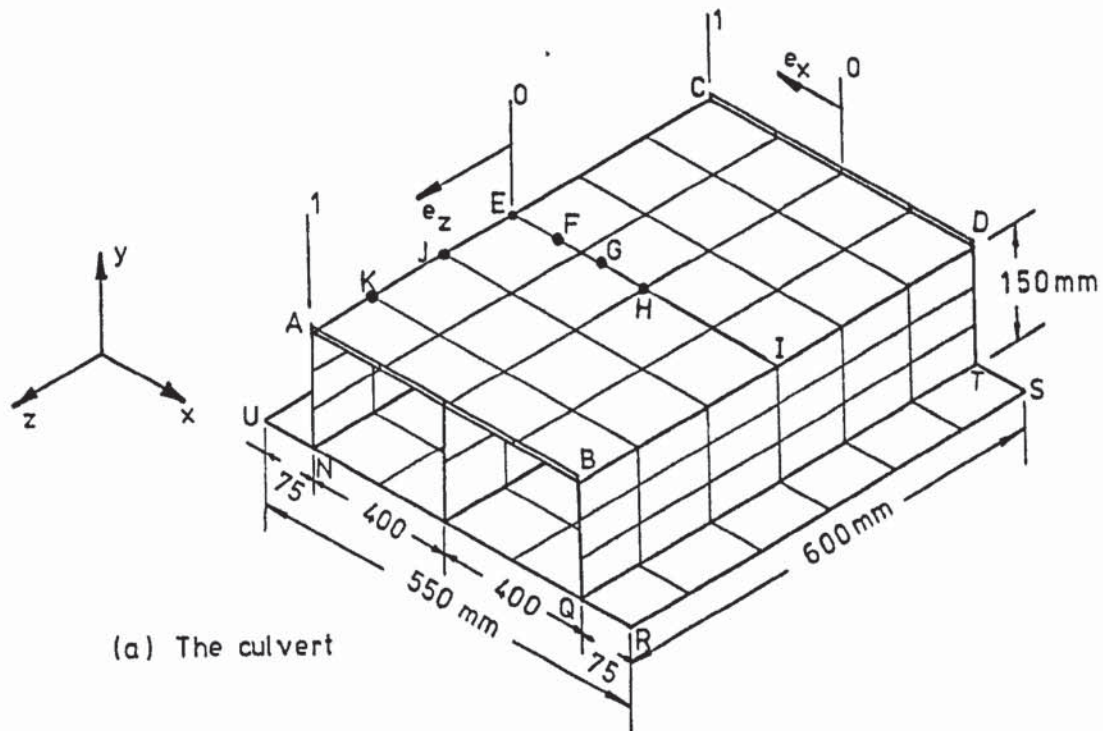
FINITE ELEMENT MESH OF FULL BOX CULVERT
